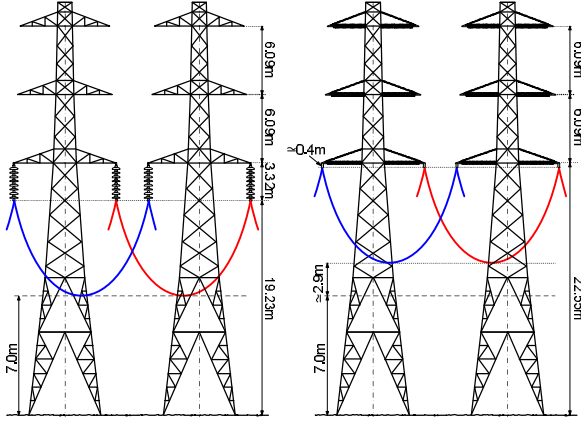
Outline diagram of existing (left) and modified (right) 275 kV L3 type lattice structure.
